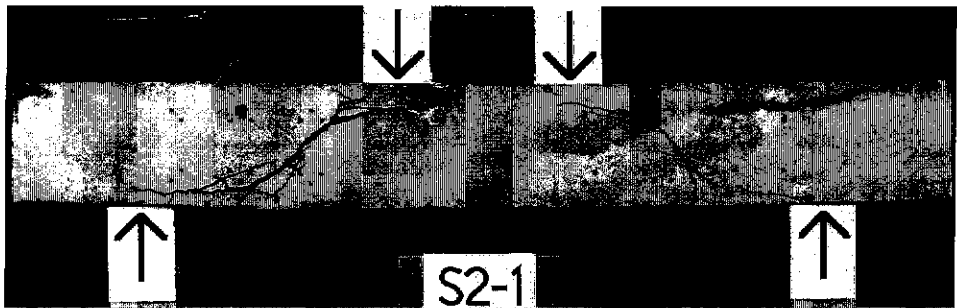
Crack Pattern of the Back Face of Beam S2-1
